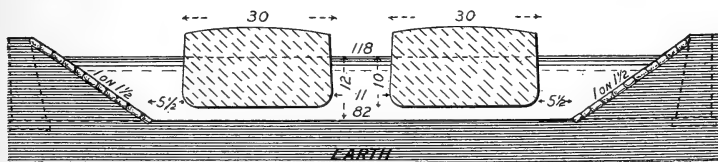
Earth section of proposed 1500-ton Barge canal.
